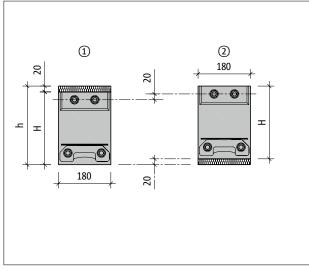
Schöck Isokorb® T type SK: Outer corner
